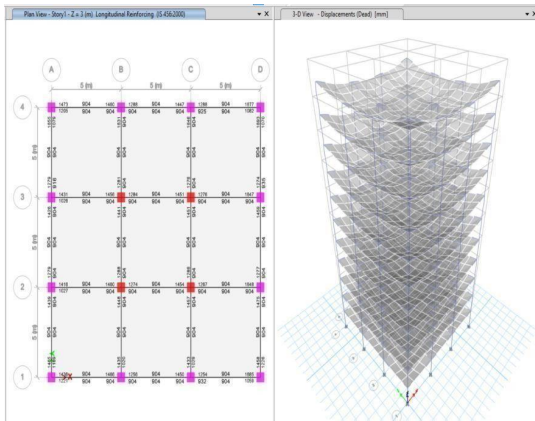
Four members of the Bare Frame Model fail at an elevation of 3m after being exposed to seismic forces in zone V.
